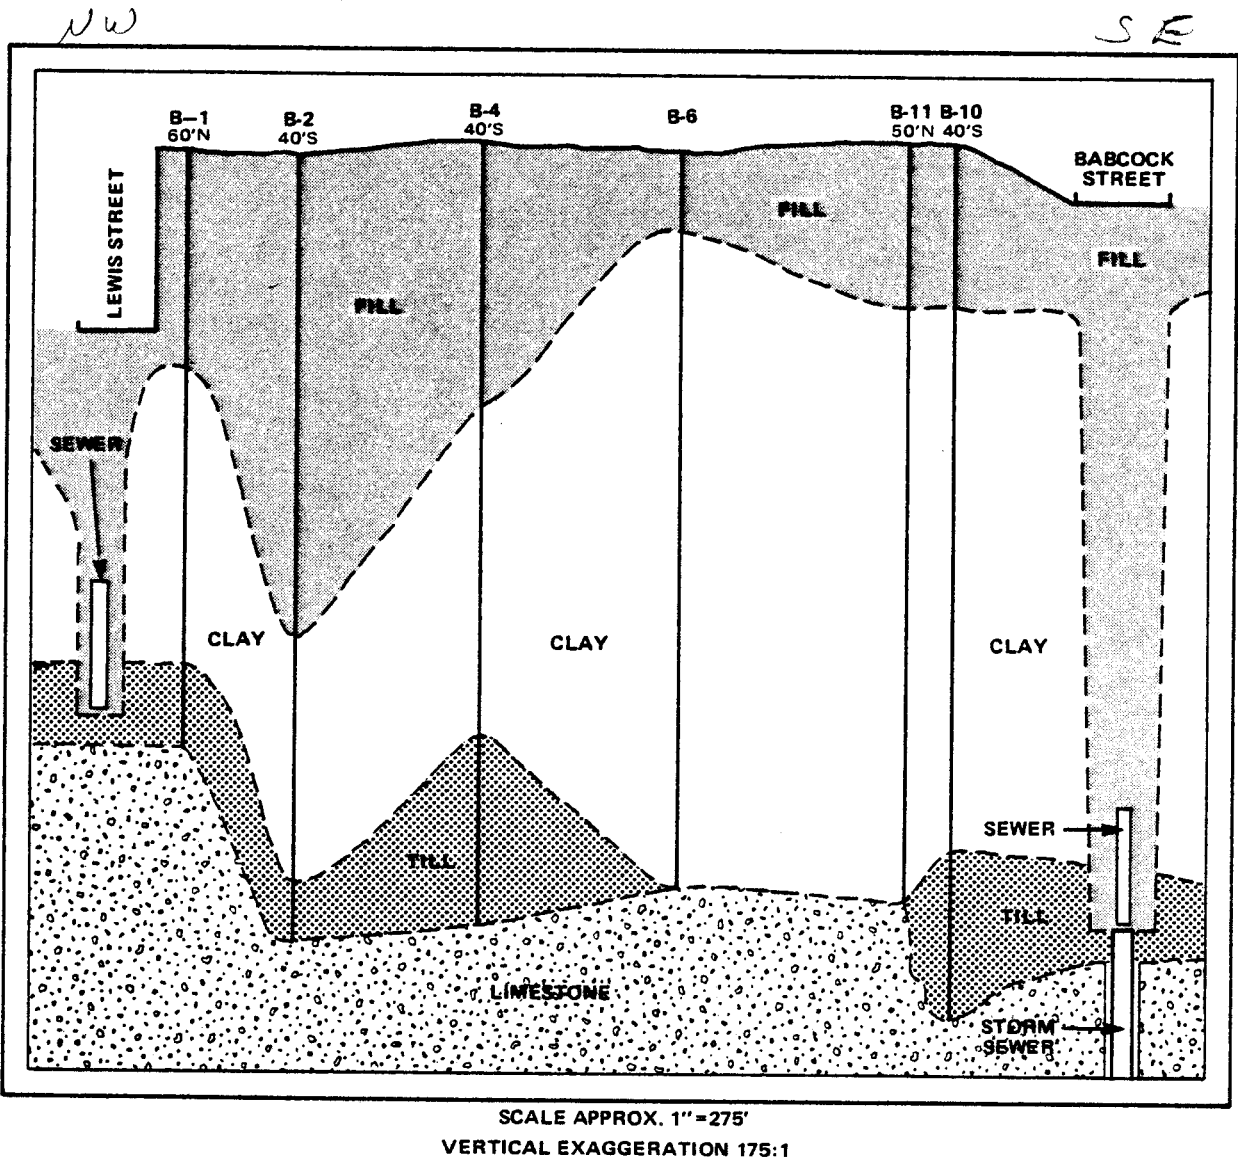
SCHEMATIC CROSS SECTION ALONG CENTERLINE OF SITE
